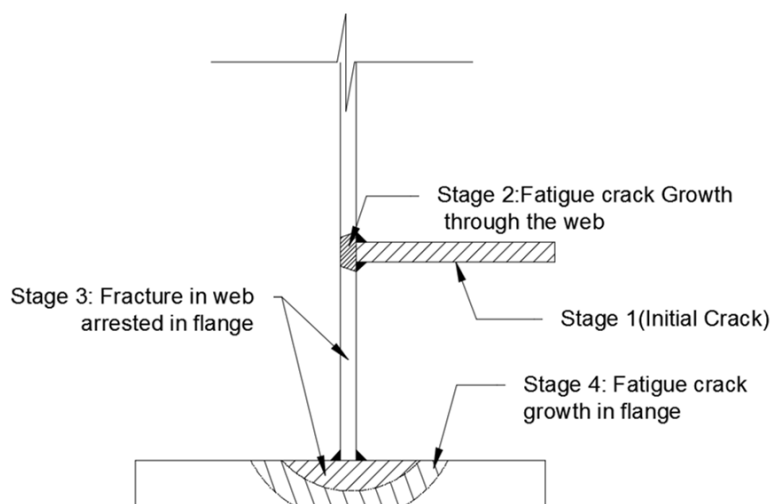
1. Four stages of crack formation and propagation in a steel girder of a bridge
